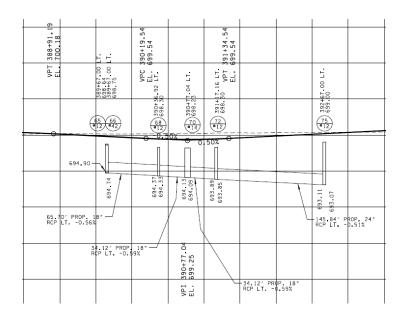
A-22B Example of Storm Drainage as shown on Proposed Profile
